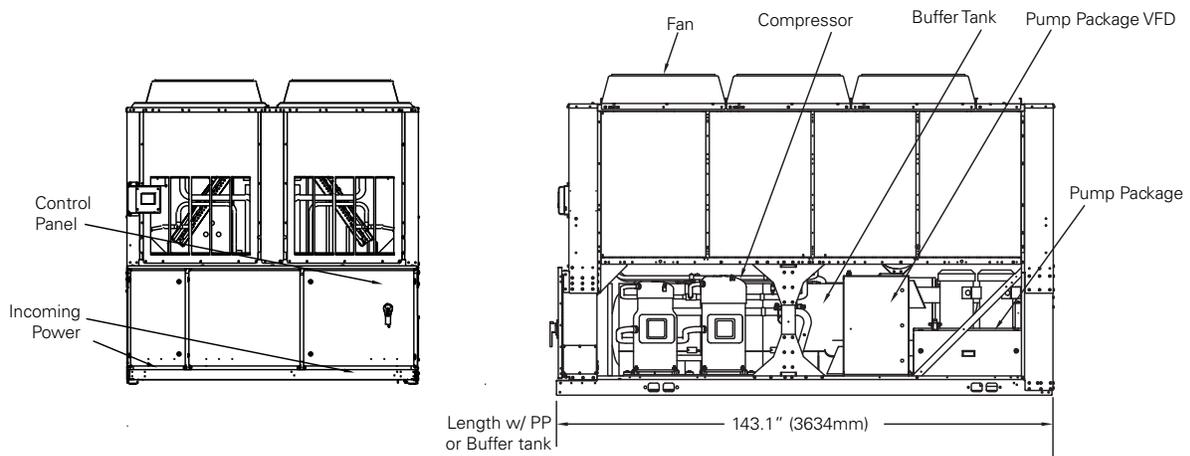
CGAM 60 and 70 ton — pump package, buffer tank, partial heat recovery
